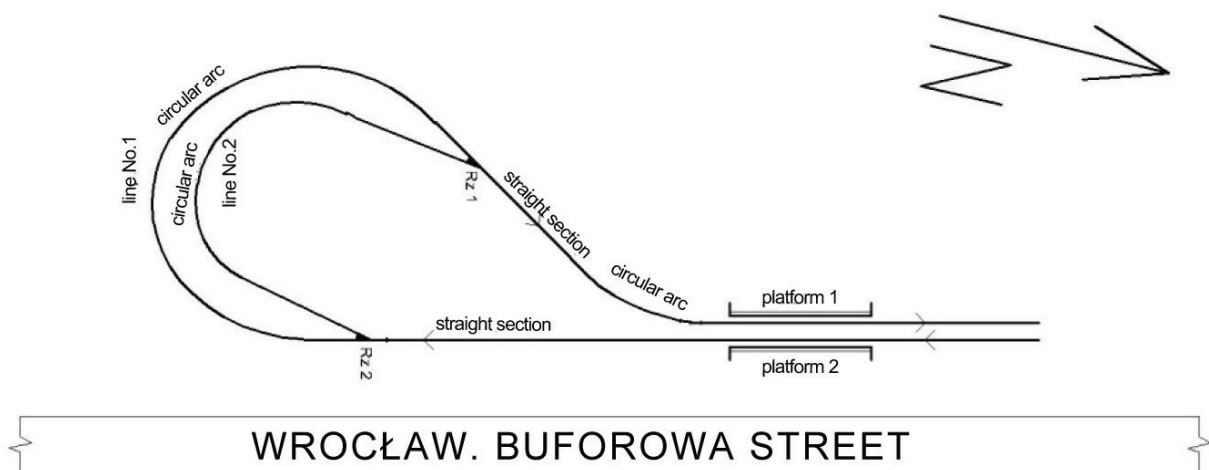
The site plan (scheme) of the proposed tram loop for a double-track line.
